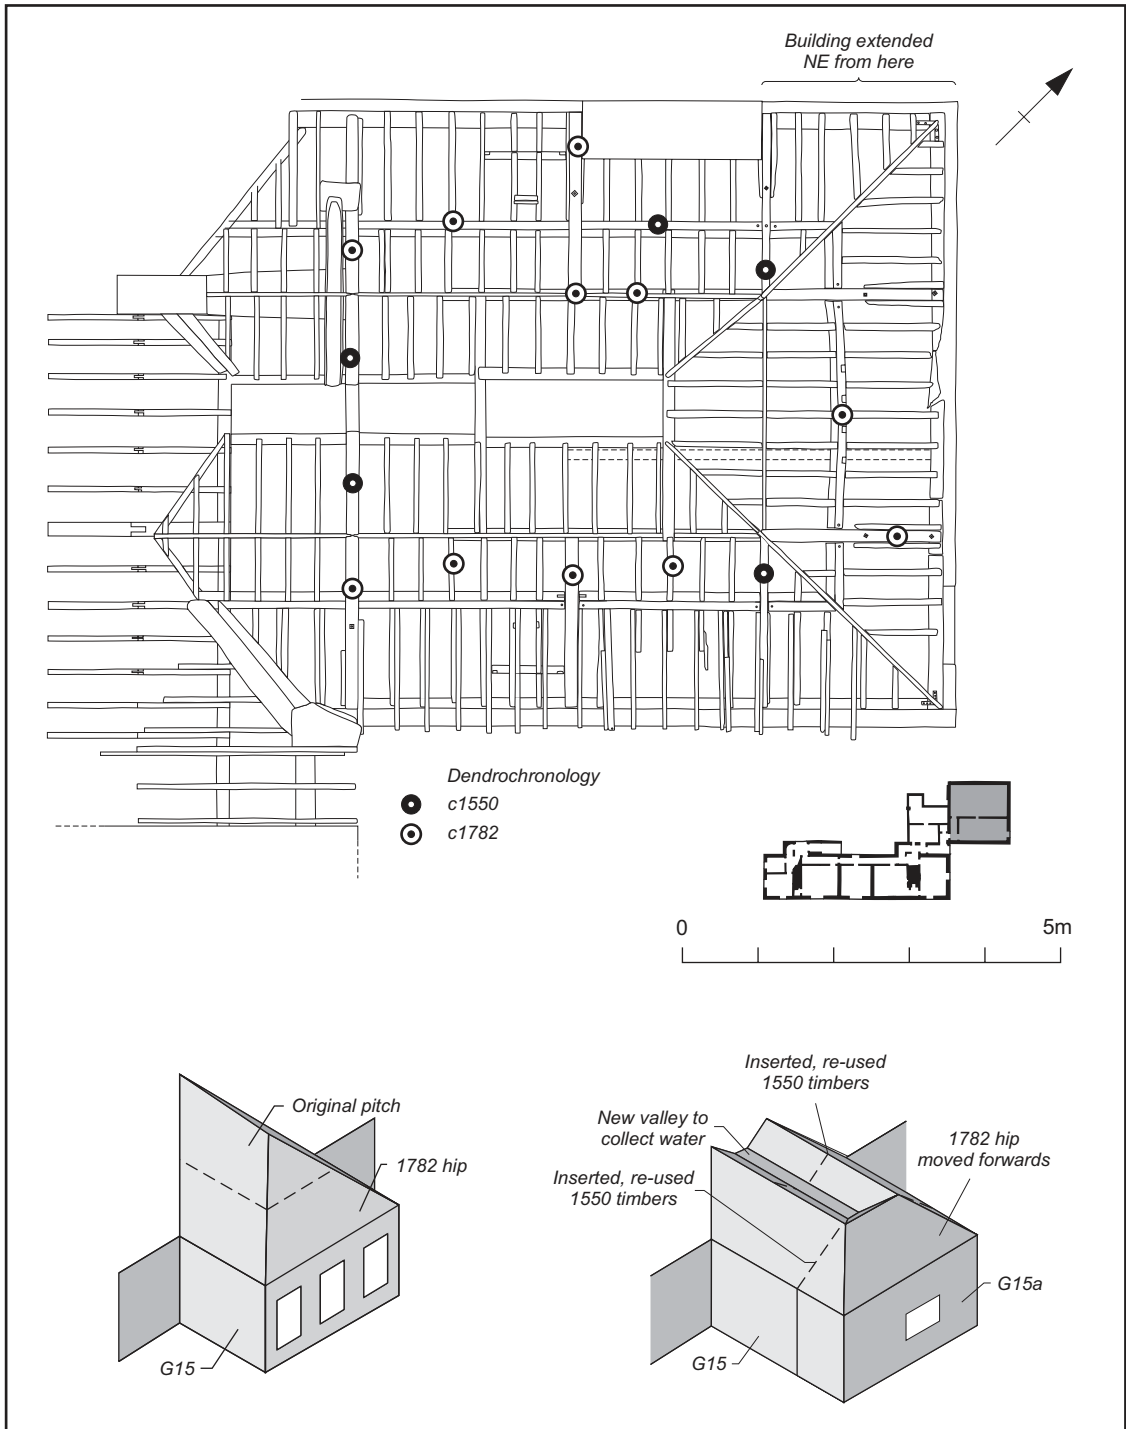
Plan and axonometric drawing of the dairy roof showing development
